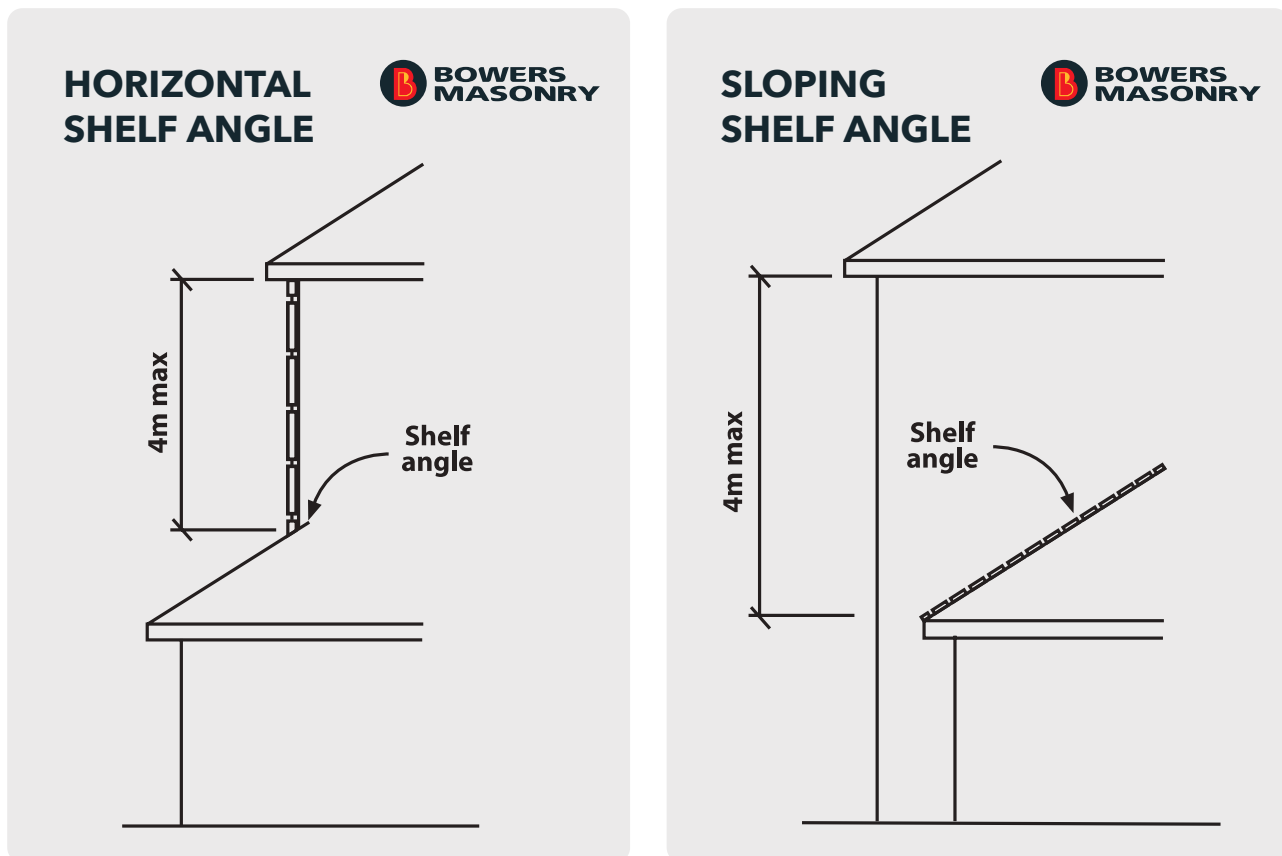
Shelf Angles - diagram sourced from Brick & Paver Manufacturers association
